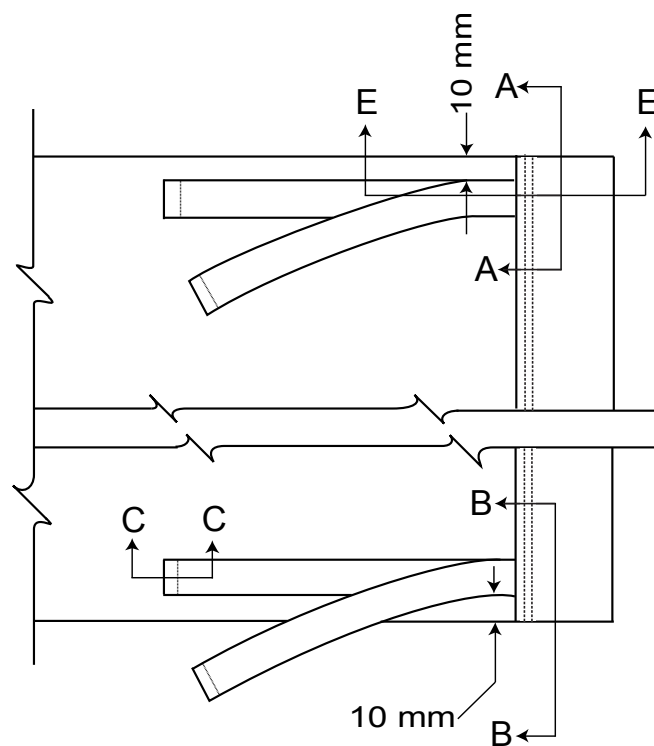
Type 2 — Header, open-sleeve with tie tapes
